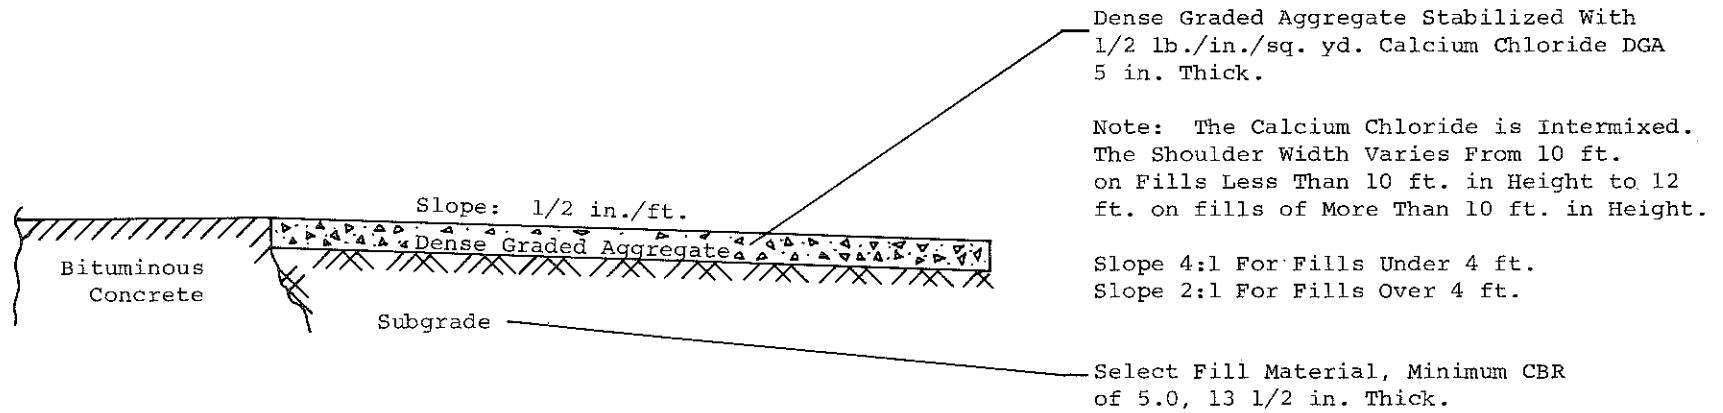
Typical Shoulder Section of the Mountain Parkway Extension as Originally Constructed.
